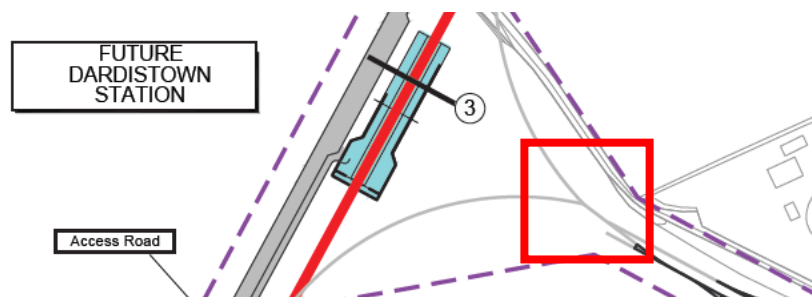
Single track pinch point on the route in/out of the proposed Dardistown Depot
